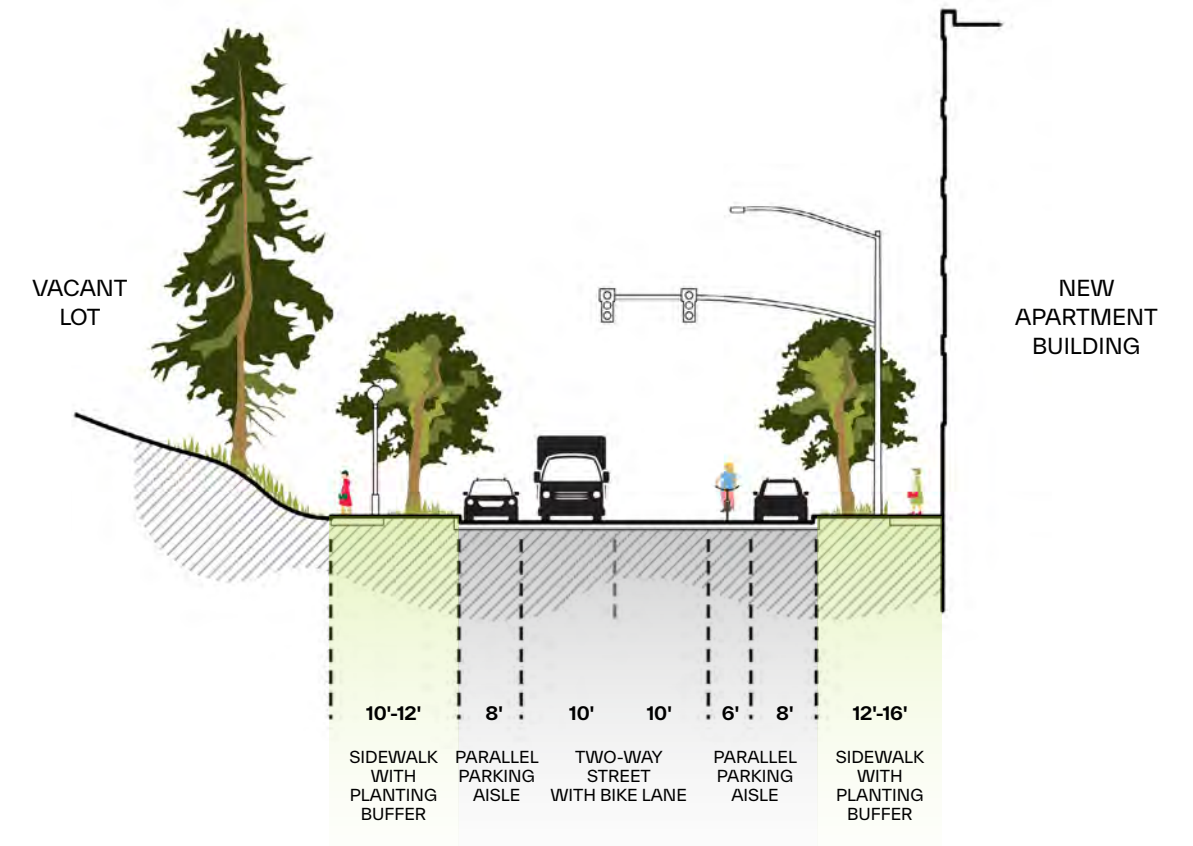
| Existing Street Section of Fawcett Avenue
